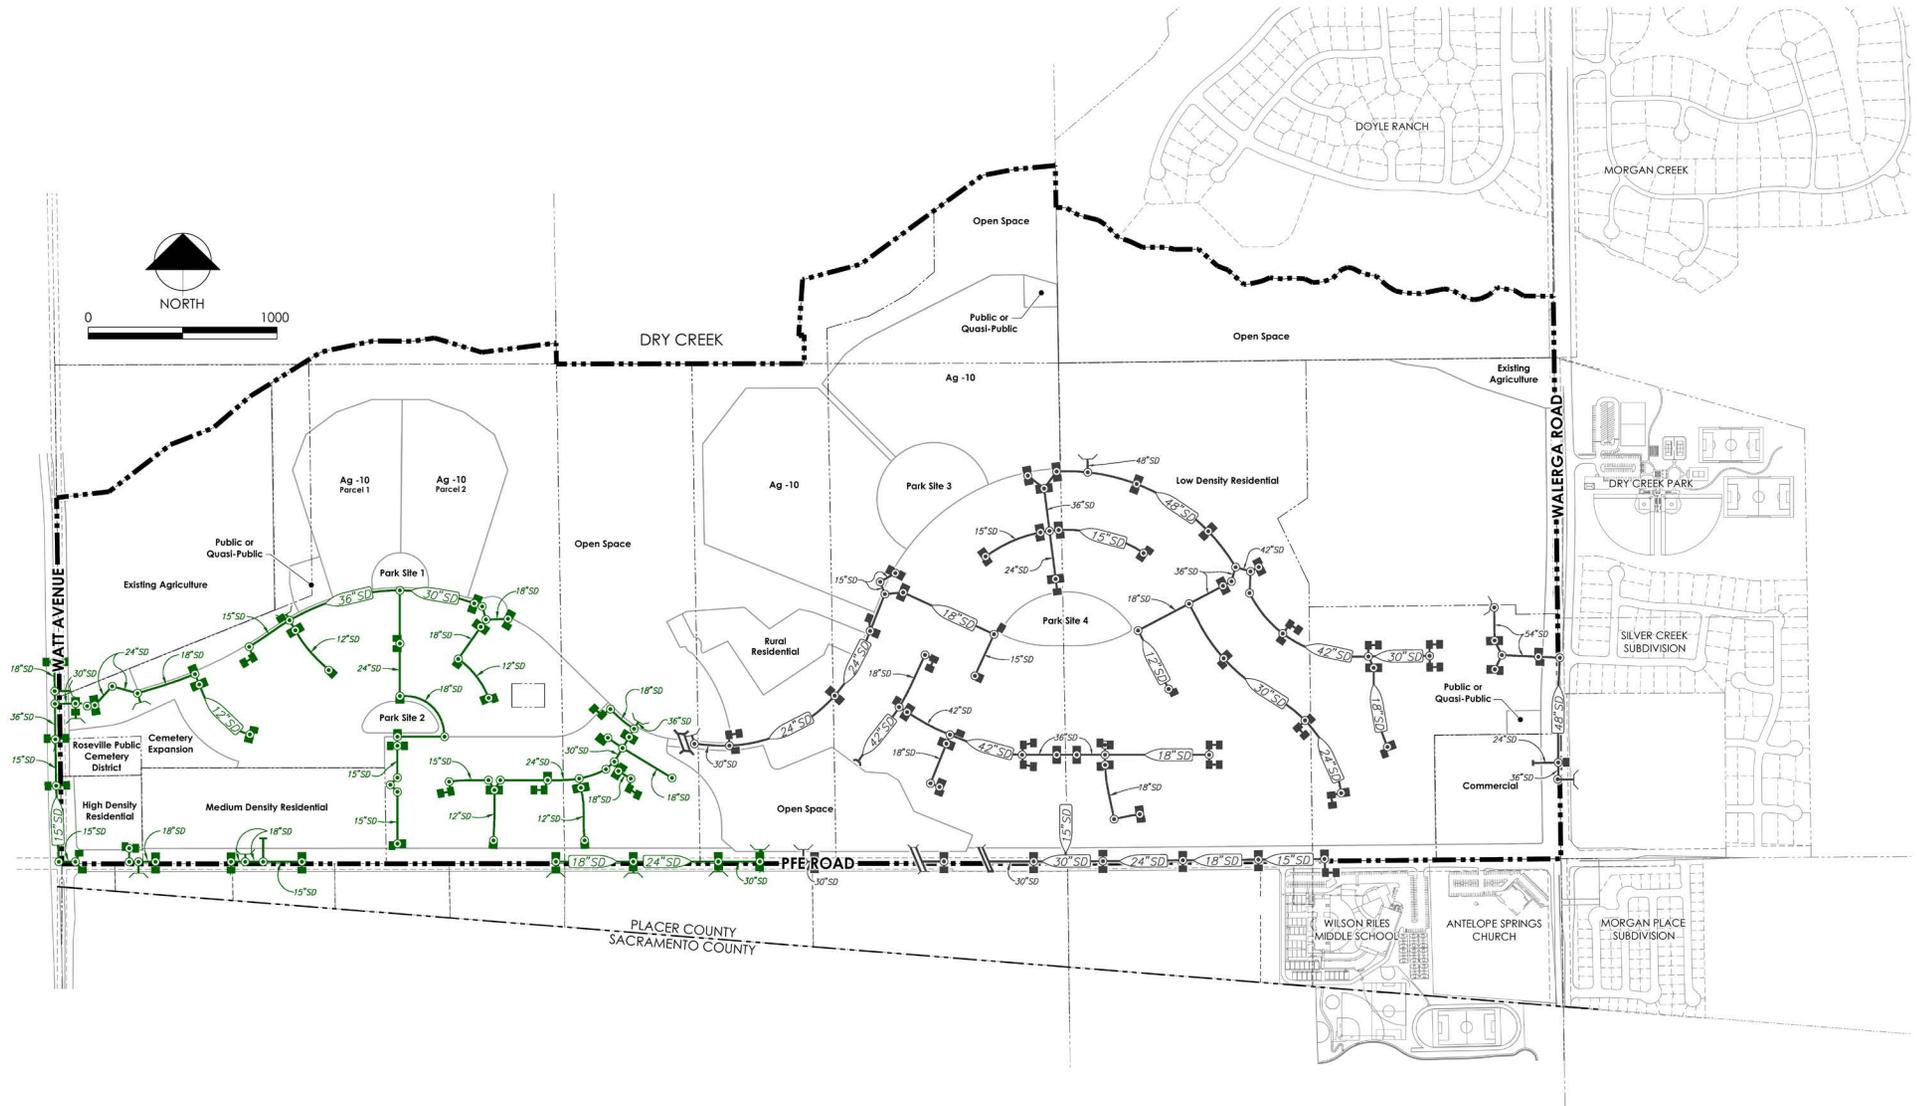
WASTEWATER ALTERNATIVE 2 AMENDED
